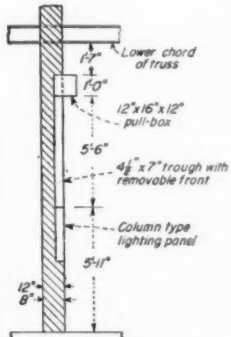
Flush installation of narrow column-type lighting panels in the building walls.
